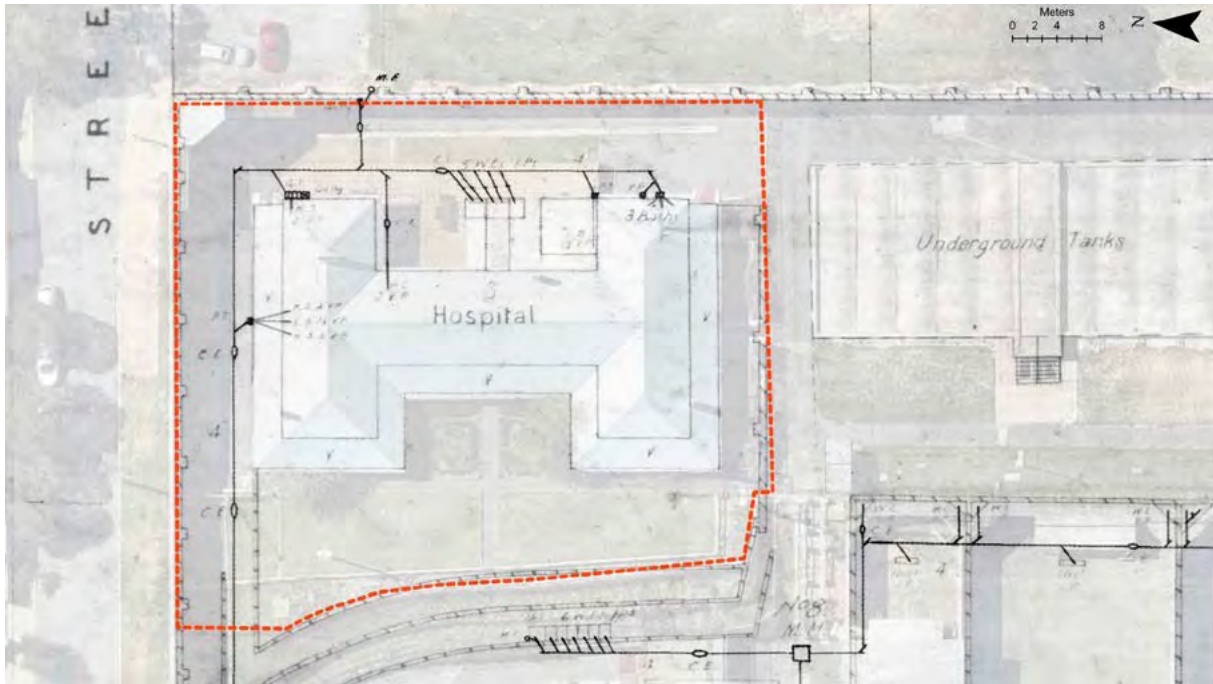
The excavation of trenches for the services indicated in this 1900 plan will have caused disturbance of earlier archaeology around the building's footprint.
